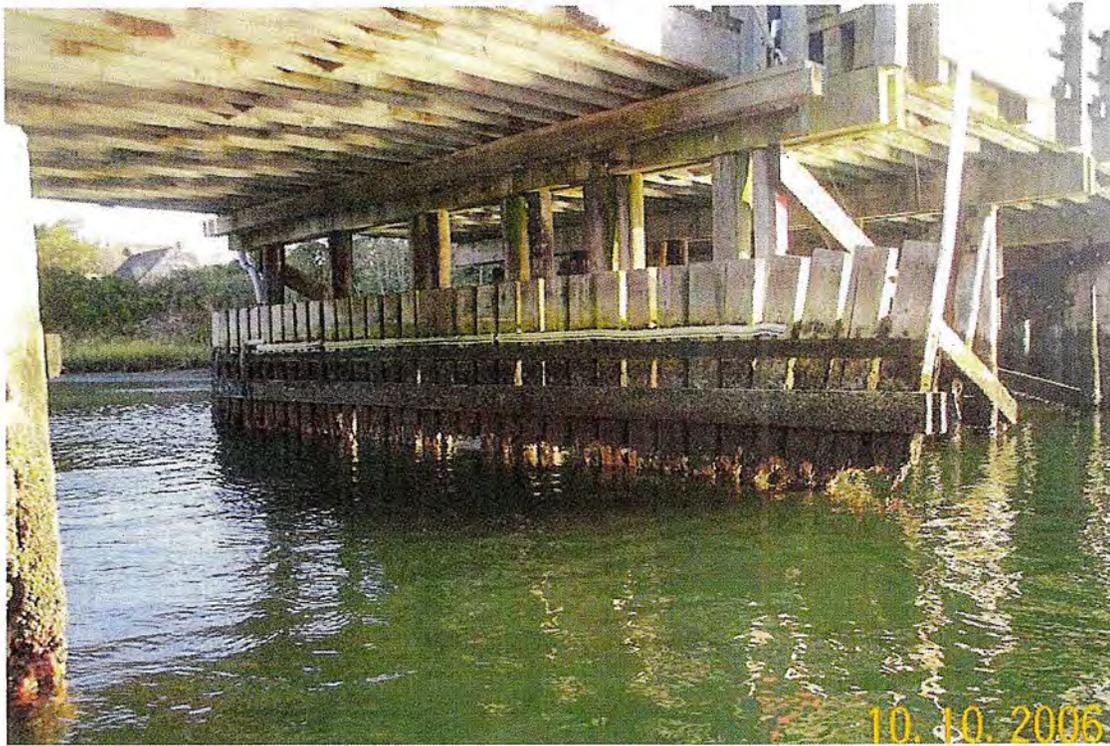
Typical condition of the vertical timber members of the fender at Bent 8, looking northeast. Note the impact damage at both ends.
